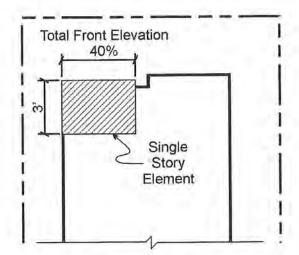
SINGLE-STORY ELEMENT SPECIFICATION
